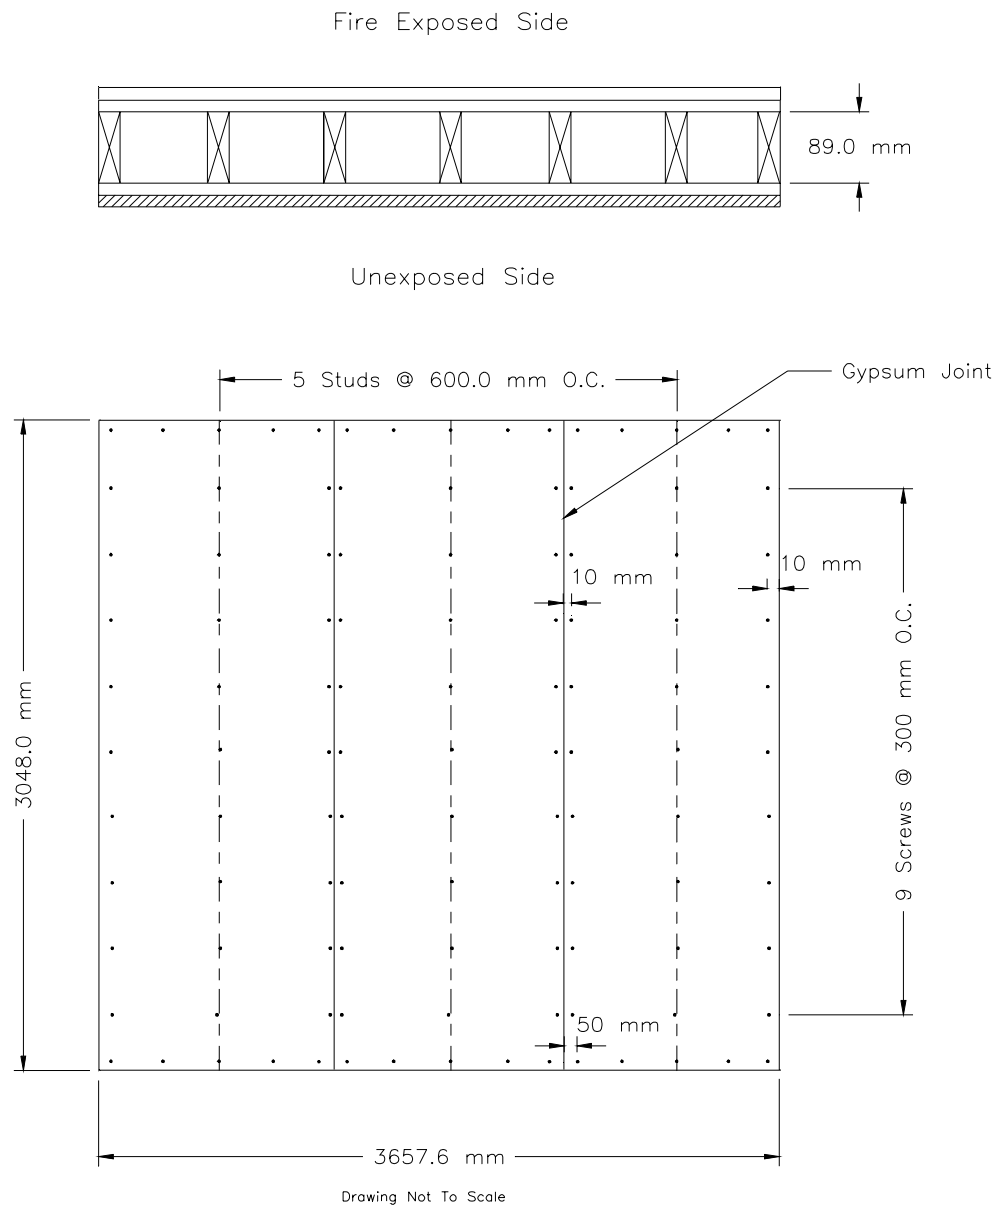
Screw Locations For Wood Stud (600 mm O.C.), 2x2 Gypsum Board Layers, Full-Scale Assembly (Face Layer, Unexposed Side)
